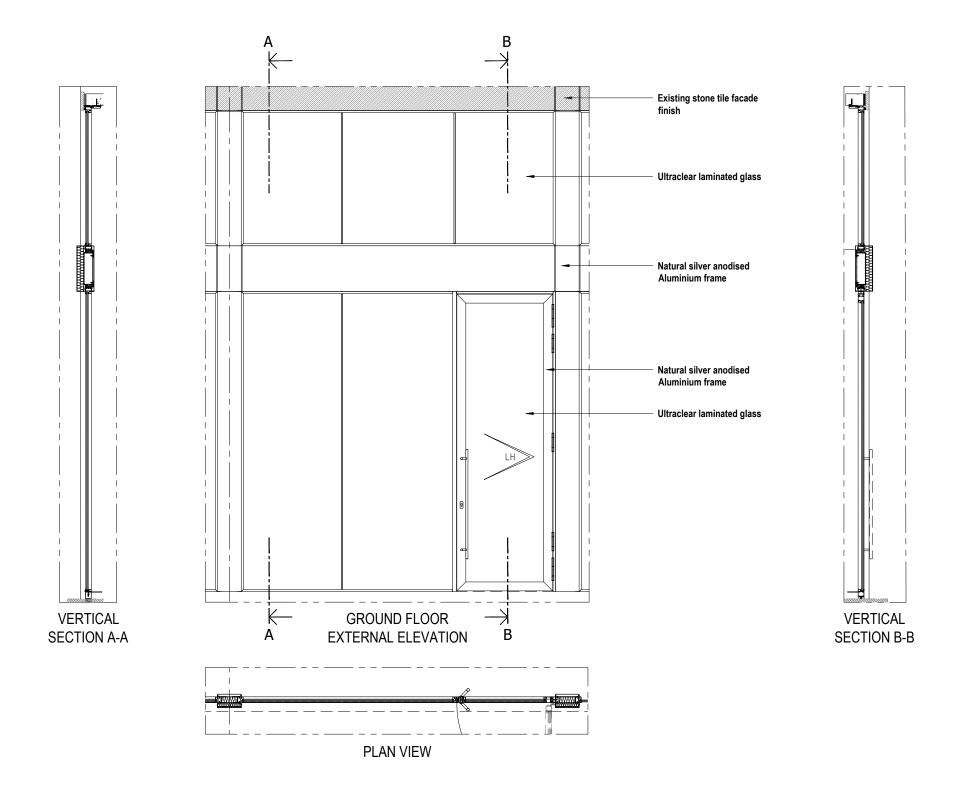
Illustrative proposed view of Kingsway reception
